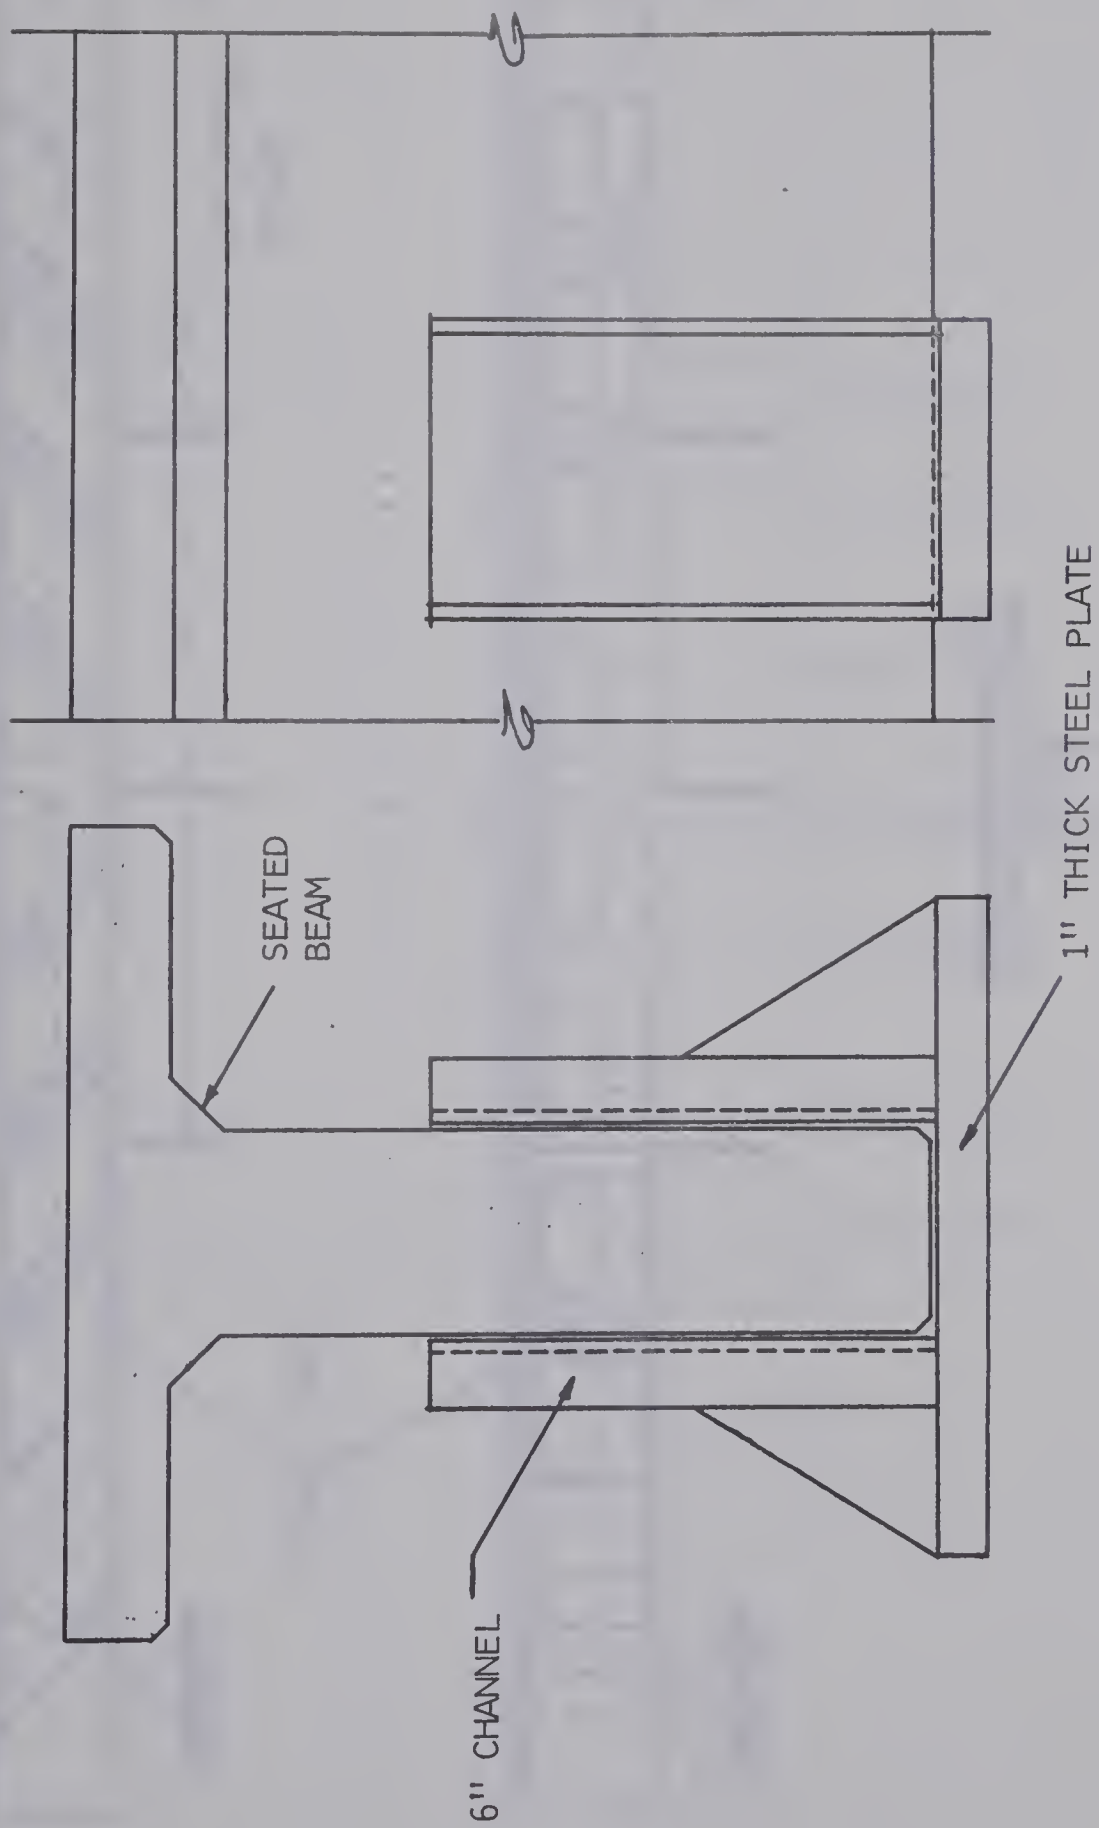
FRONT AND SIDE ELEVATIONS OF TYPICAL BEAM SEAT
